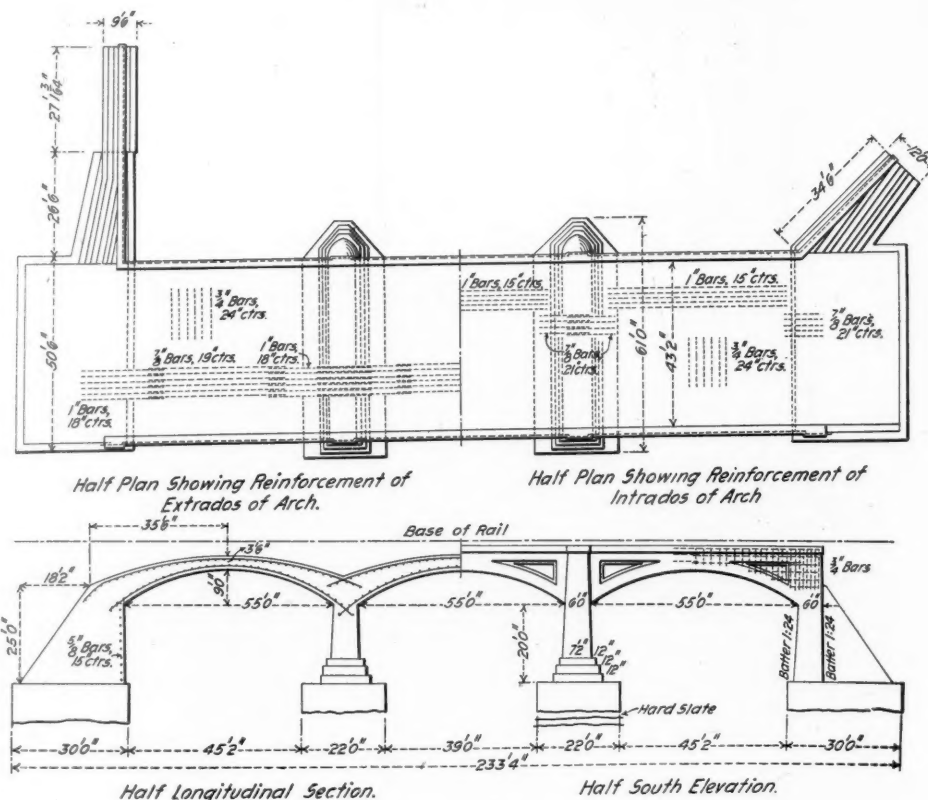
Plan and Elevation of Eagle Creek Bridge.
